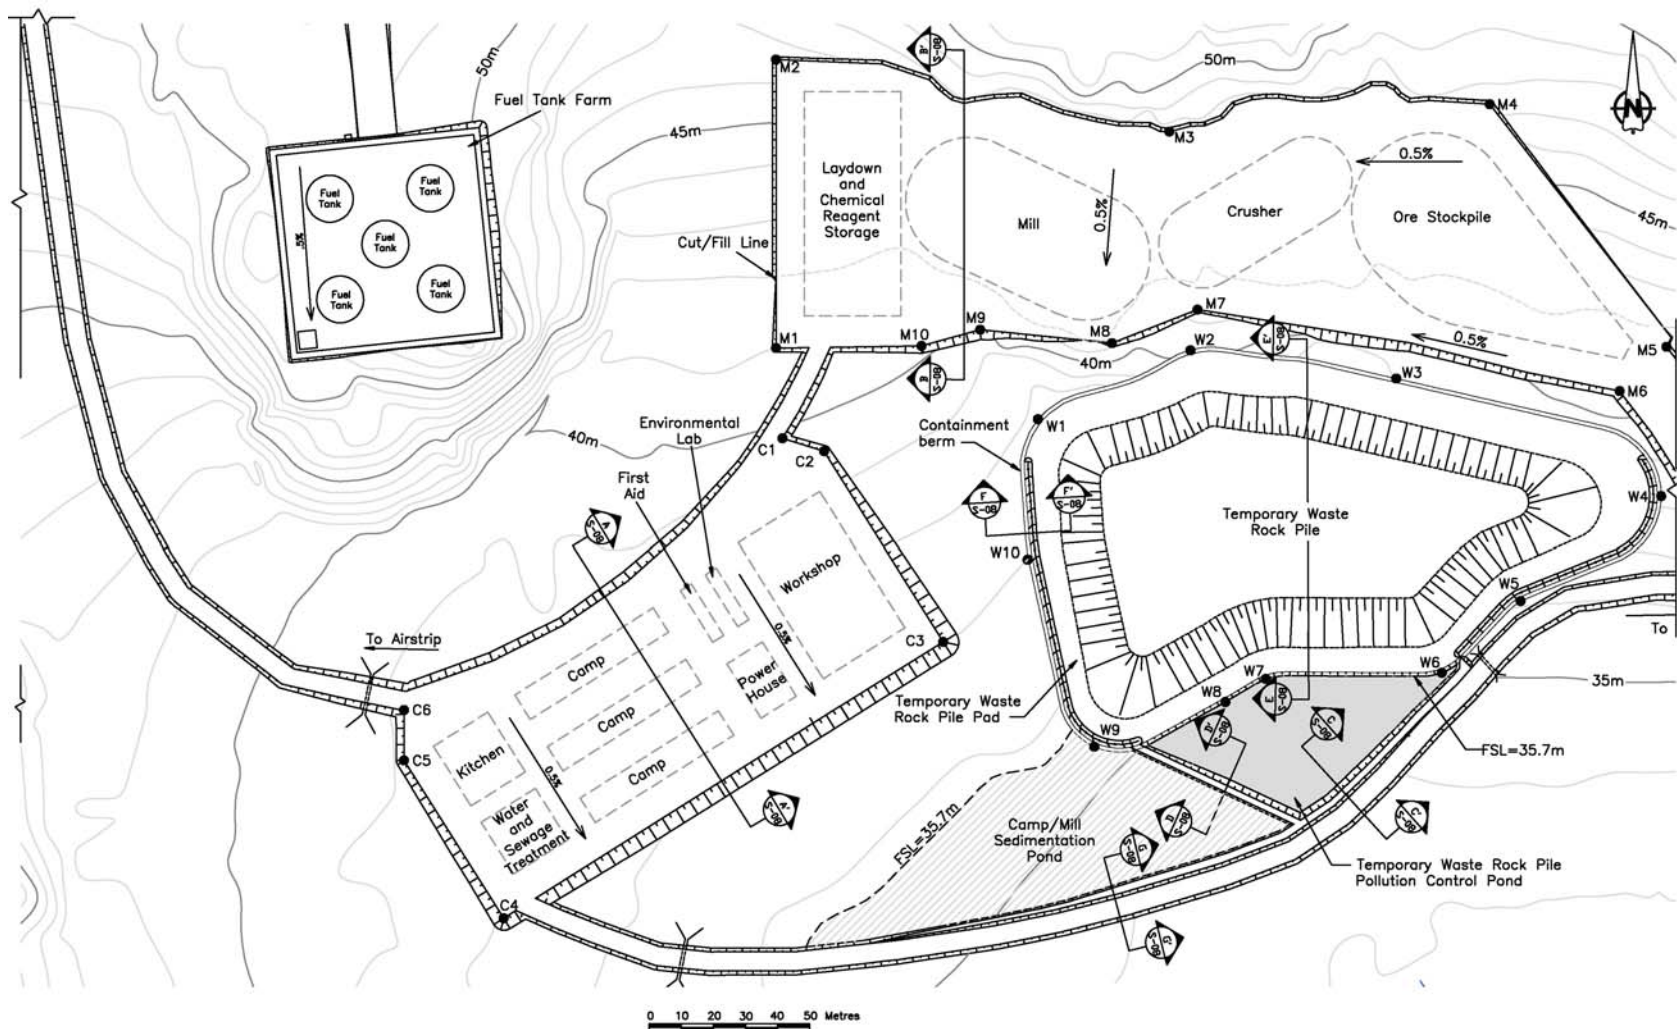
Detailed Site Infrastructure Layout at Mill/Camp Location
